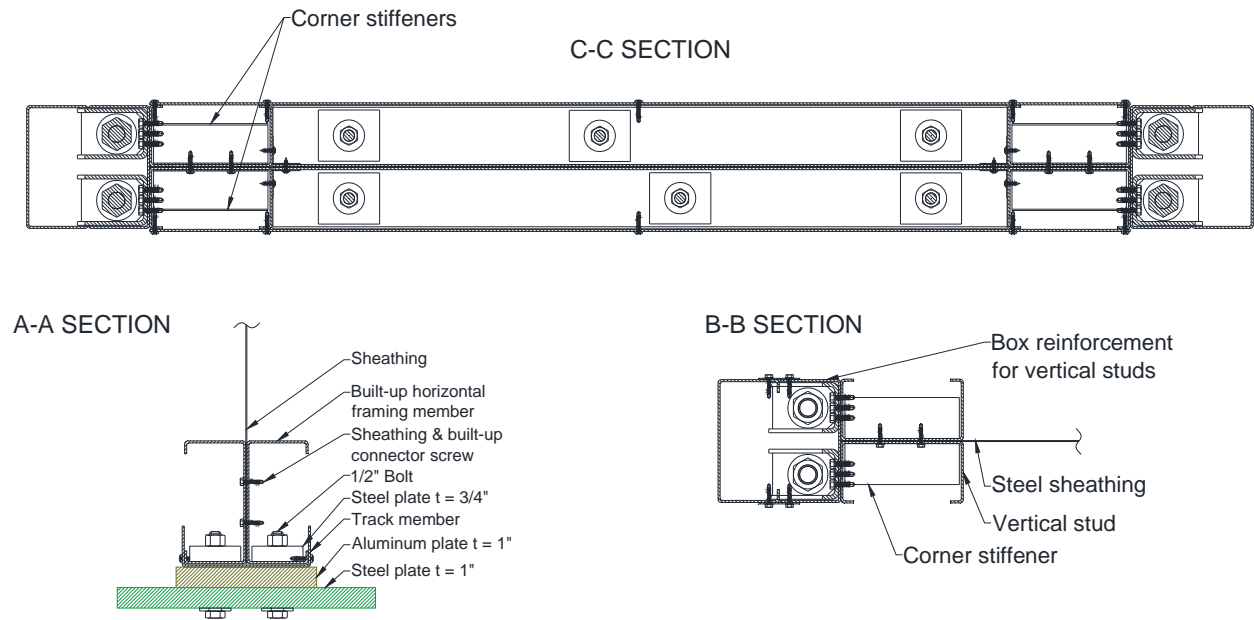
Centre-sheathed configuration: final level of reinforcement (R3) – cross-sections
